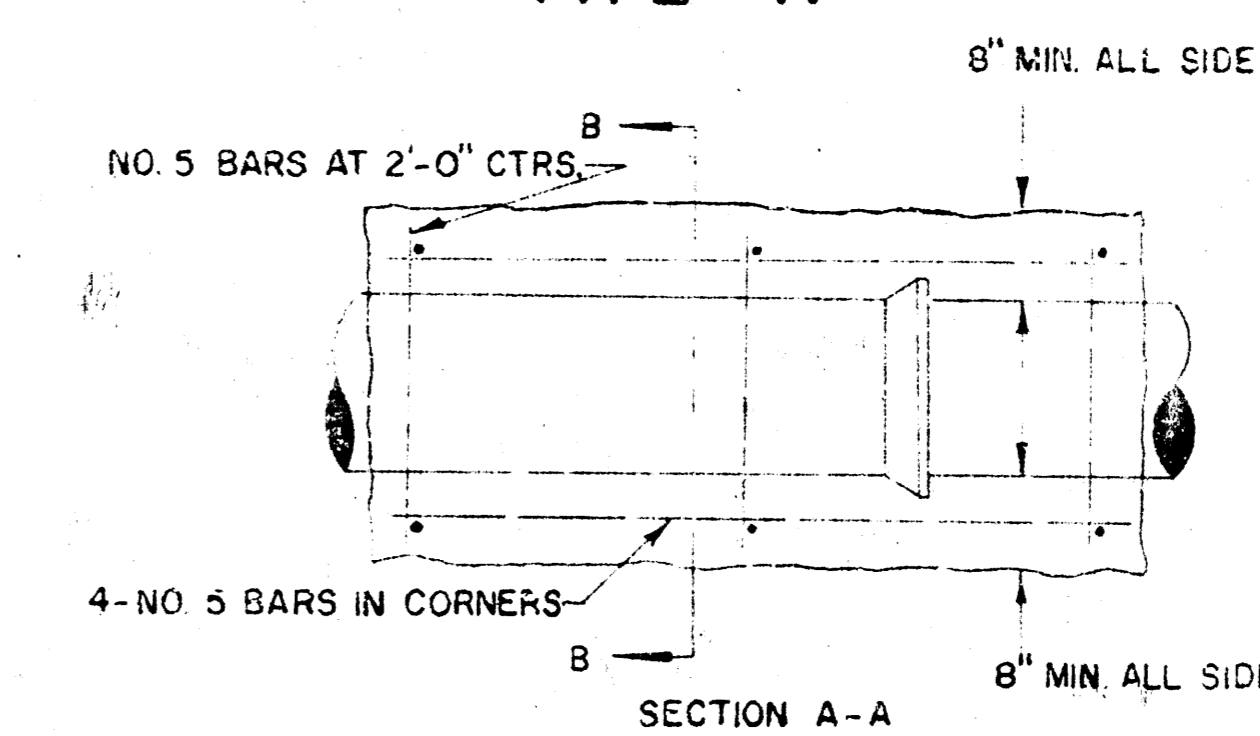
DETAIL OF DROP STACK FOR EXISTING MANHOLES IN GROUND WATER
